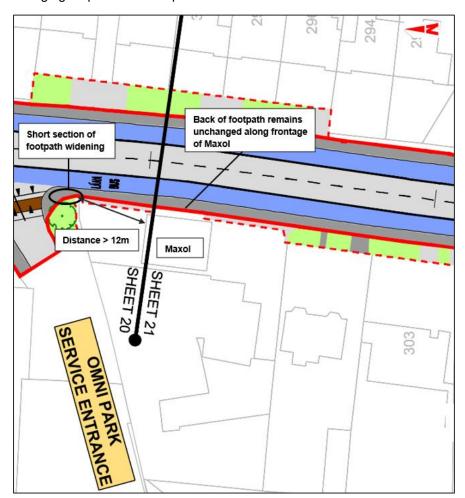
Extract from General Arrangement Drawing at Maxol (Sheet 21)
